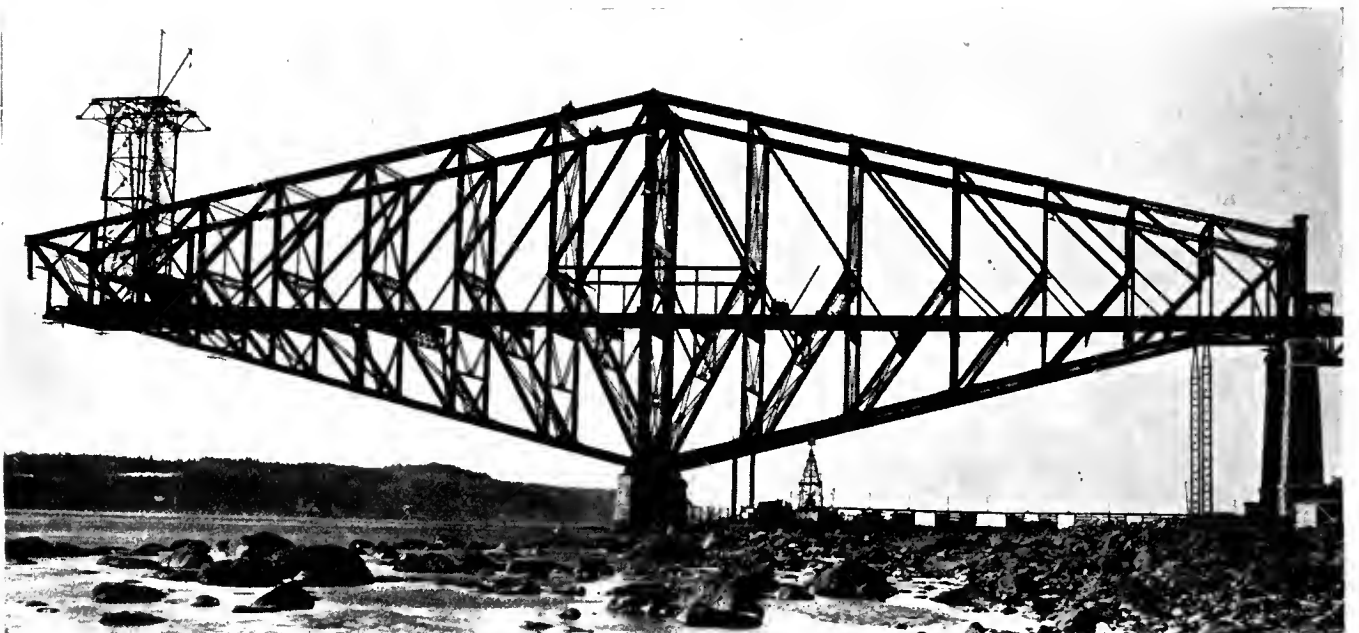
Completed north anchor and cantilever arm—Traveler being taken down to be used in the erection of the suspended span.
